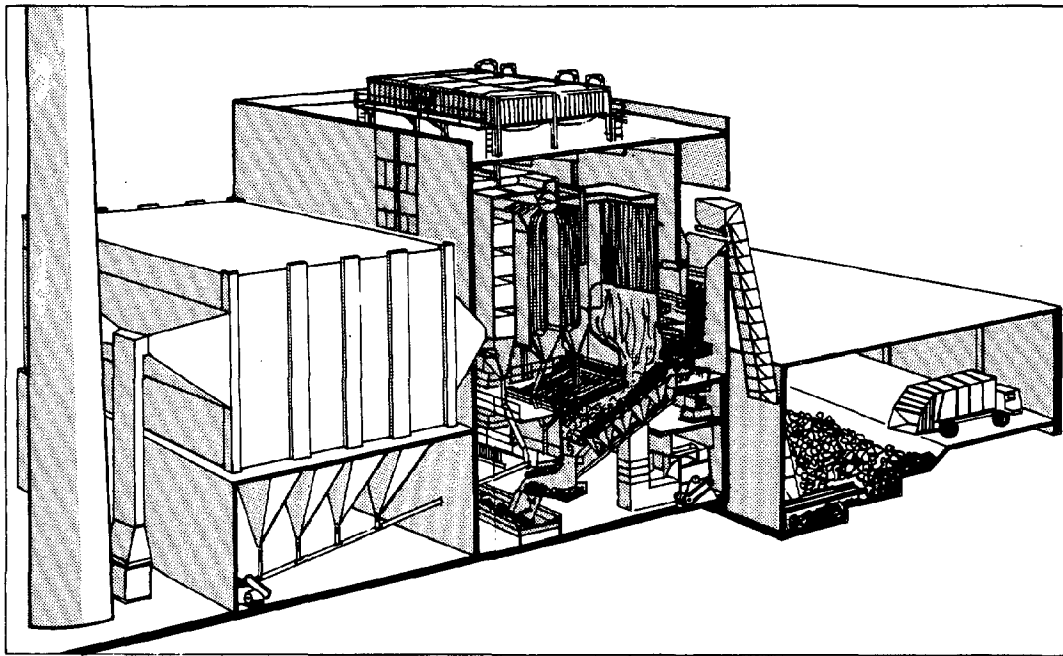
is an illustration of a typical resource recovery facility, showing the reception area and waterwall incinerator. Figure 2 is a site plan of a typical RRF, and figure 3 is an elevation diagram.
